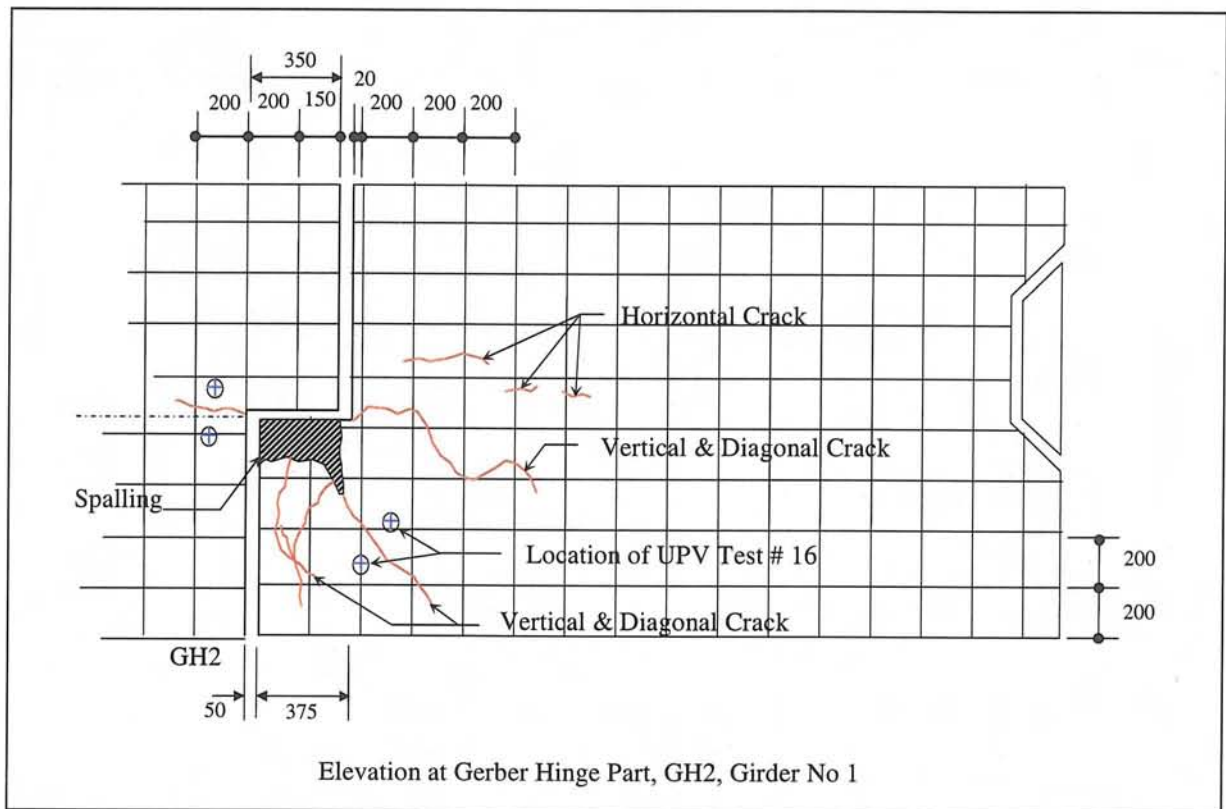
Observed Crack Pattern in Gerber Hinge Part of Guadalupe Bridge
